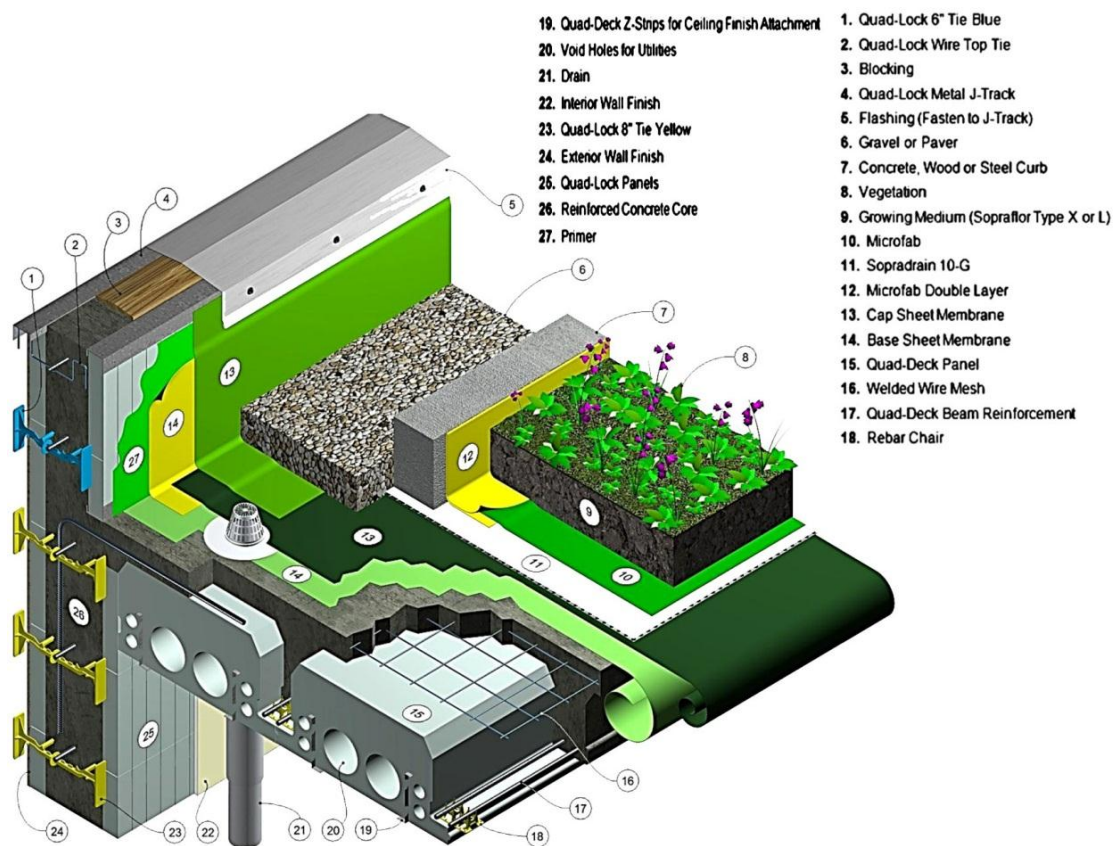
Typical detail for a green roof installation (LEED accredited) Quad-Lock.
